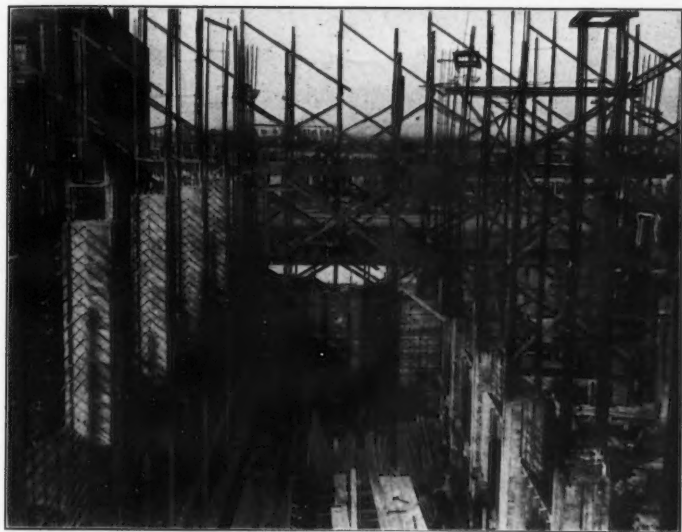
REINFORCED CONCRETE STRUCTURE FOR ICE STORAGE.
